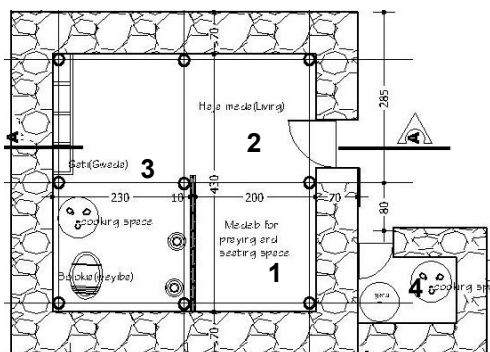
320 Plan of Sheikh Mohamed Yasin Kemal's *derb bet
